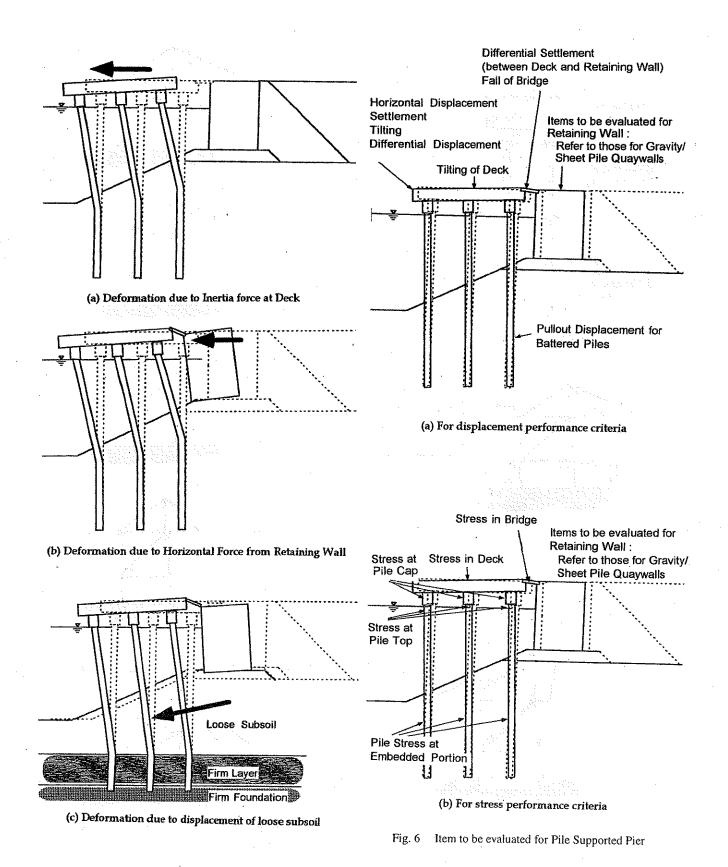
Deformation/Failure Mode of Pile Supported Pier
